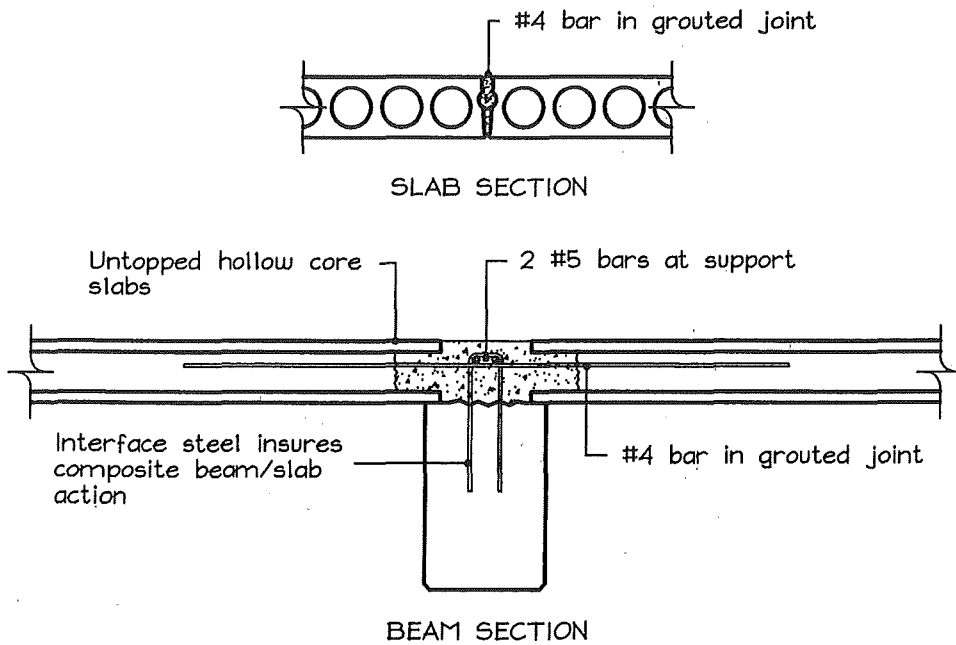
Untopped hollow core floor diaphragm connection detail utilising chord-tie reinforcement and grouted tie bars [after Moustafa, 1981]
